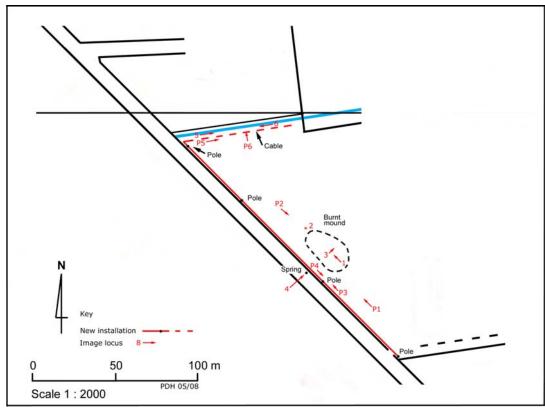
Site layout (sketch plan). Numbers and arrows indicate photographs
